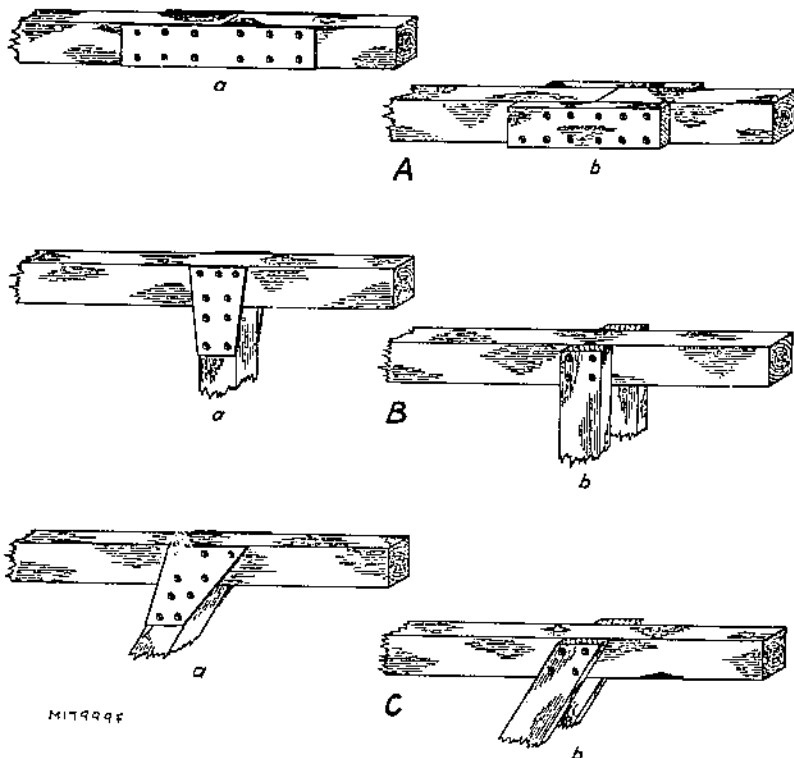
Typical joints: A, Bearing parallel to the grain; B, bearing perpendicular to the grain; C, bearing at an angle with the grain; a, metal splice plates; b, wood splice plates or divided member
